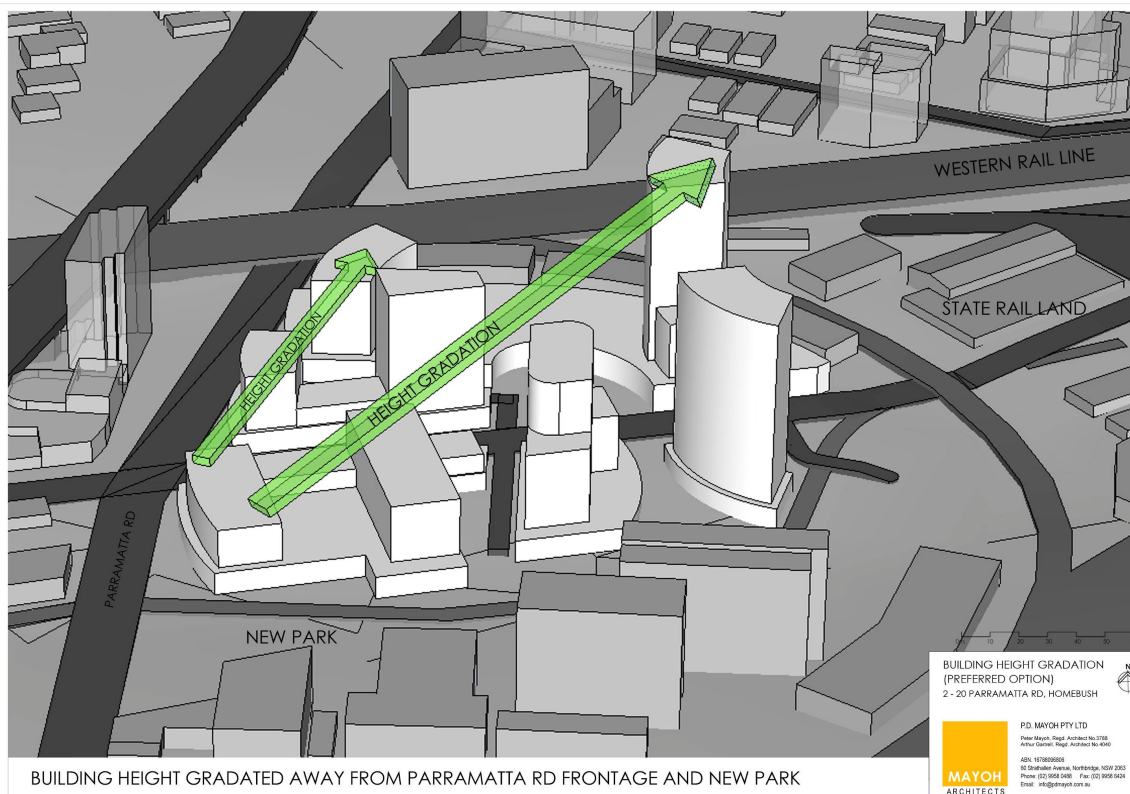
DESIGN PRINCIPLES - BUILDING HEIGHT GRADATION
